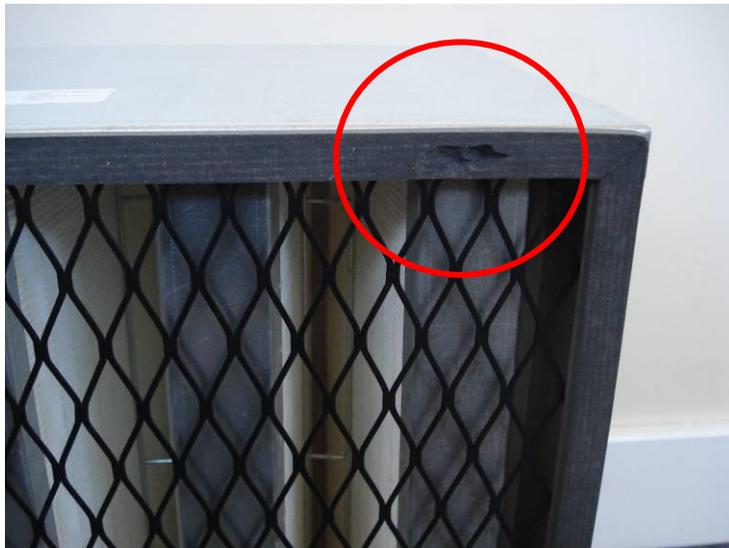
, Push Through Filter With Part Of The Front Seal Missing.
